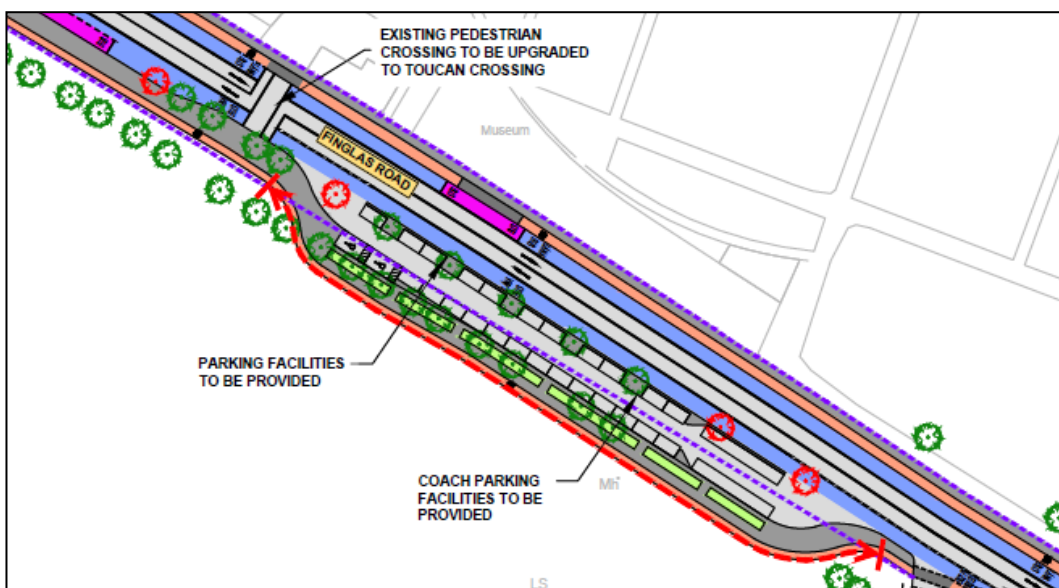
Proposed Larger Car Park on Finglas Road at Glasnevin Cemetery (Option B)
